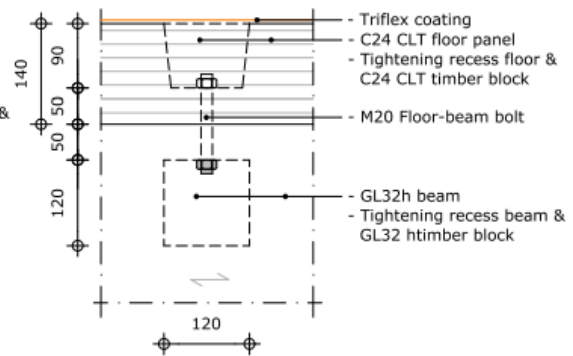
Cross-section D-D final design floor-to-beam connection in mm
